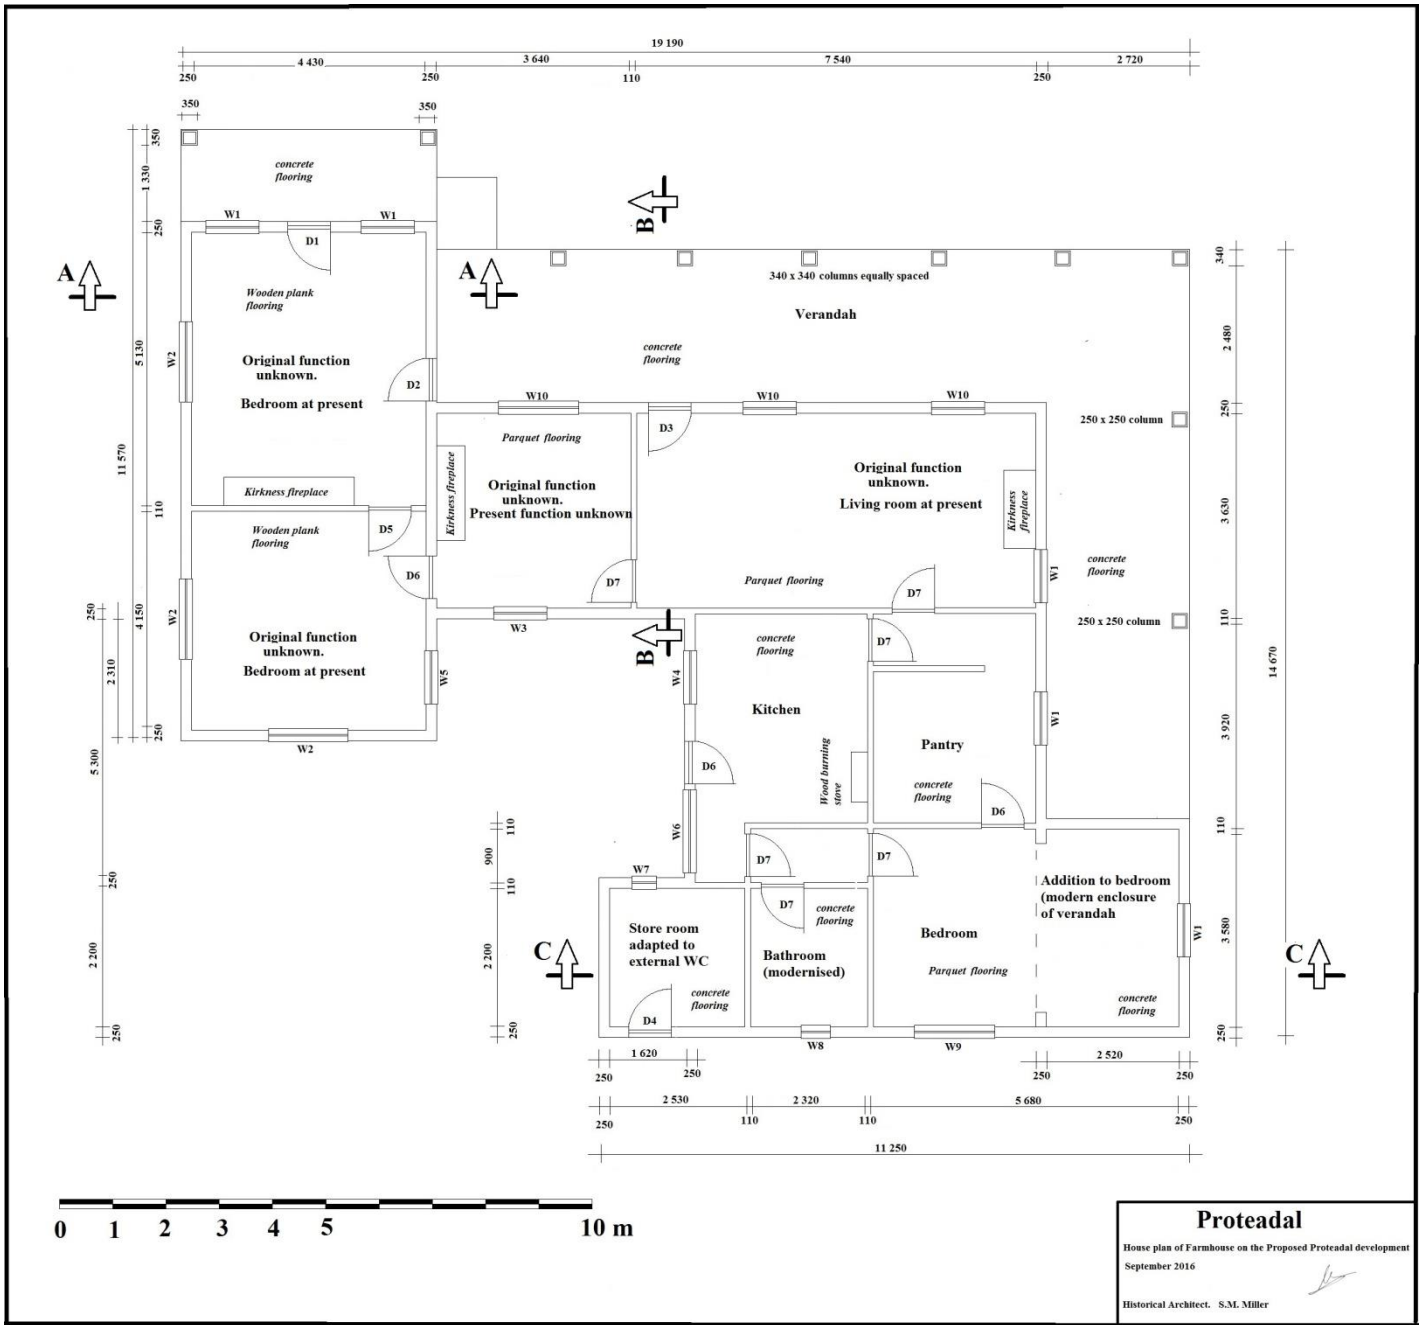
Layout of the dwelling as recorded in 2016. (Drawing S.M. Miller.)²⁰
